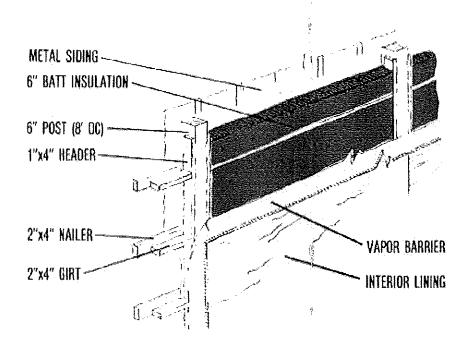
Post wall with 6-inch batt insulation (R=21+). Post wall with 6-inch batt insulation is beneficial in solar-heated buildings where heat conservation is especially important.
